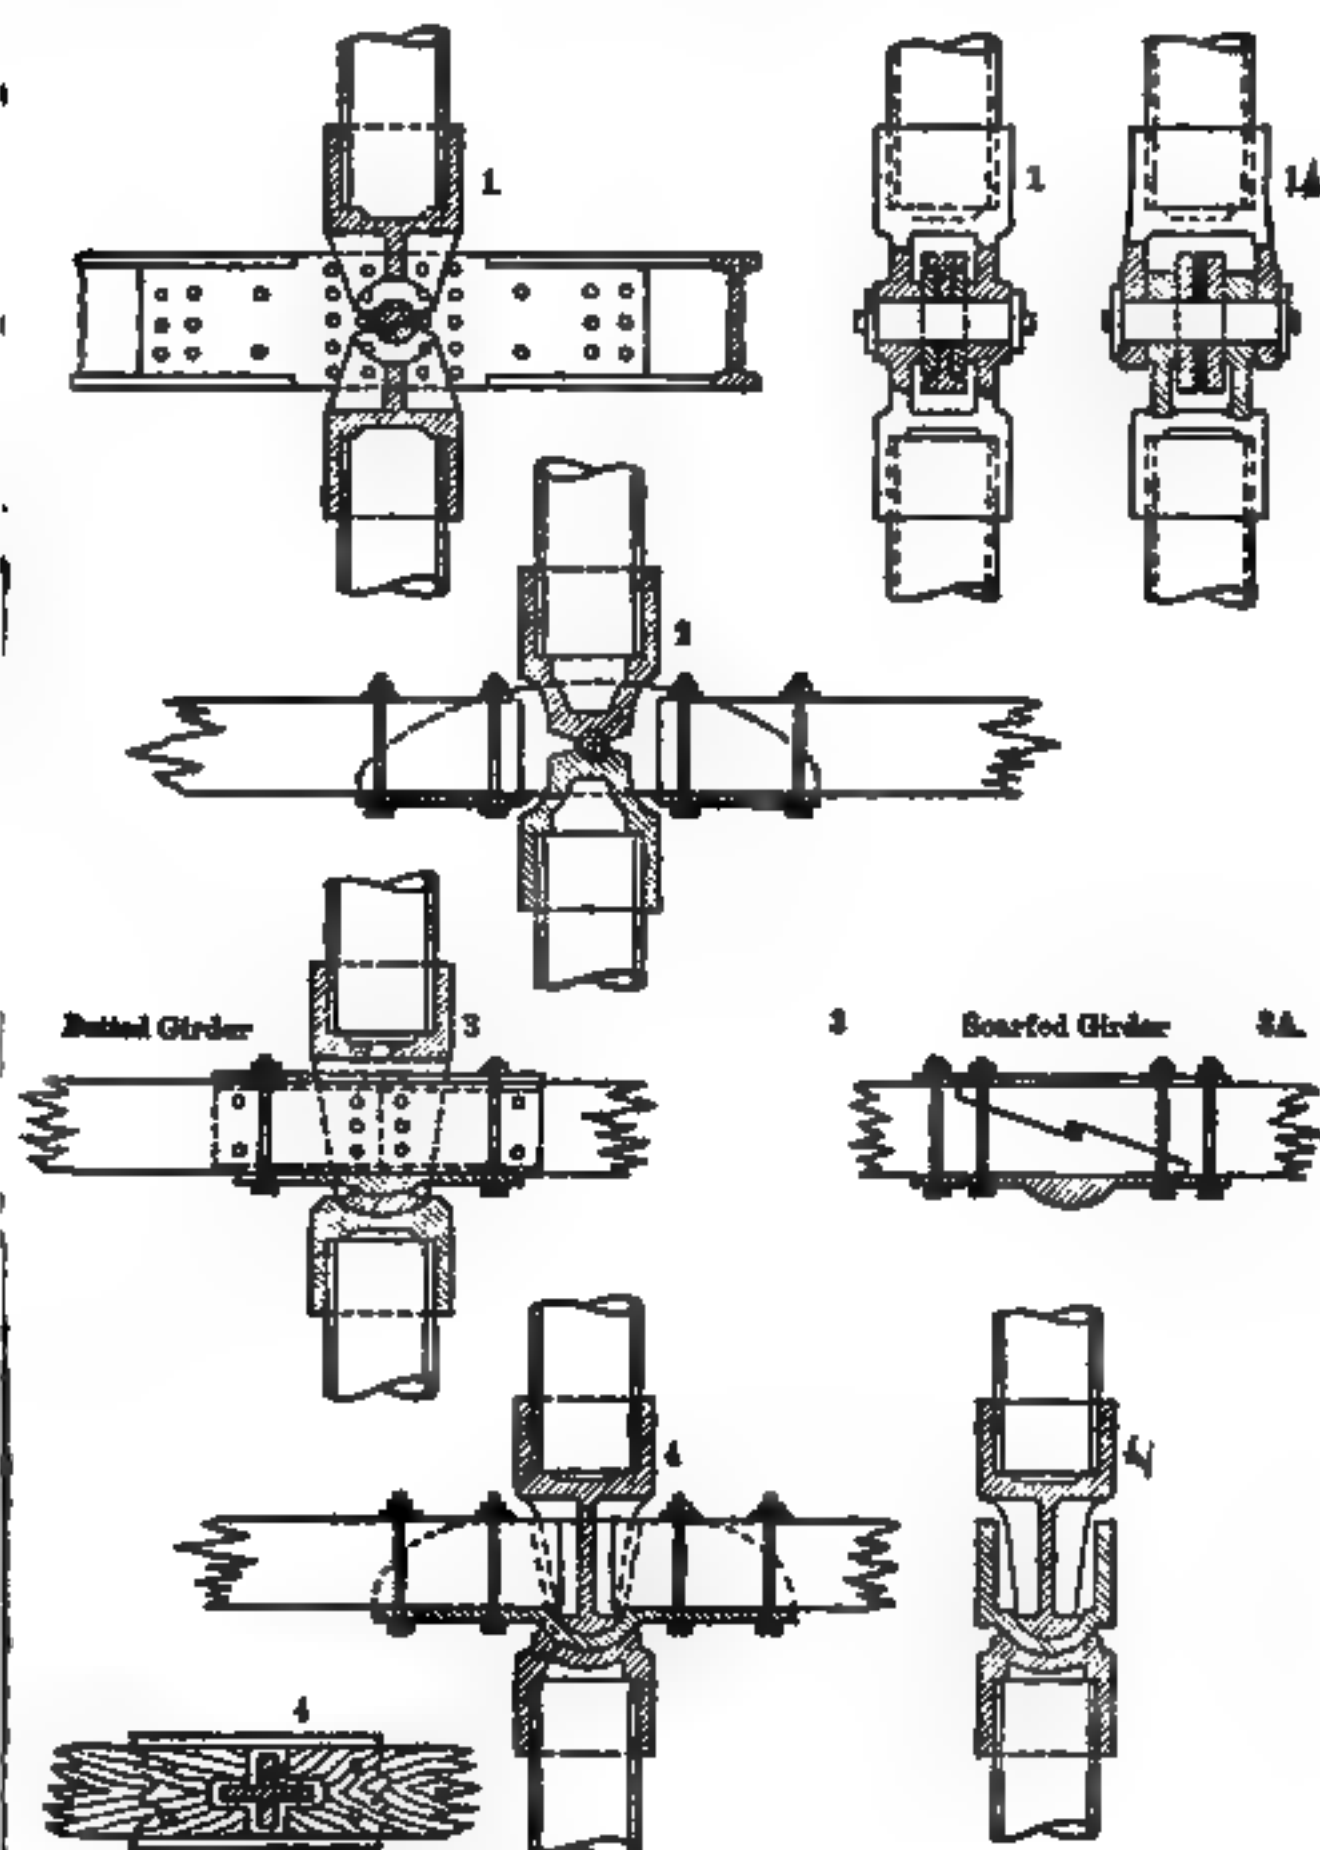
Connections, Caps and Bases for Steel-pipe Columns
